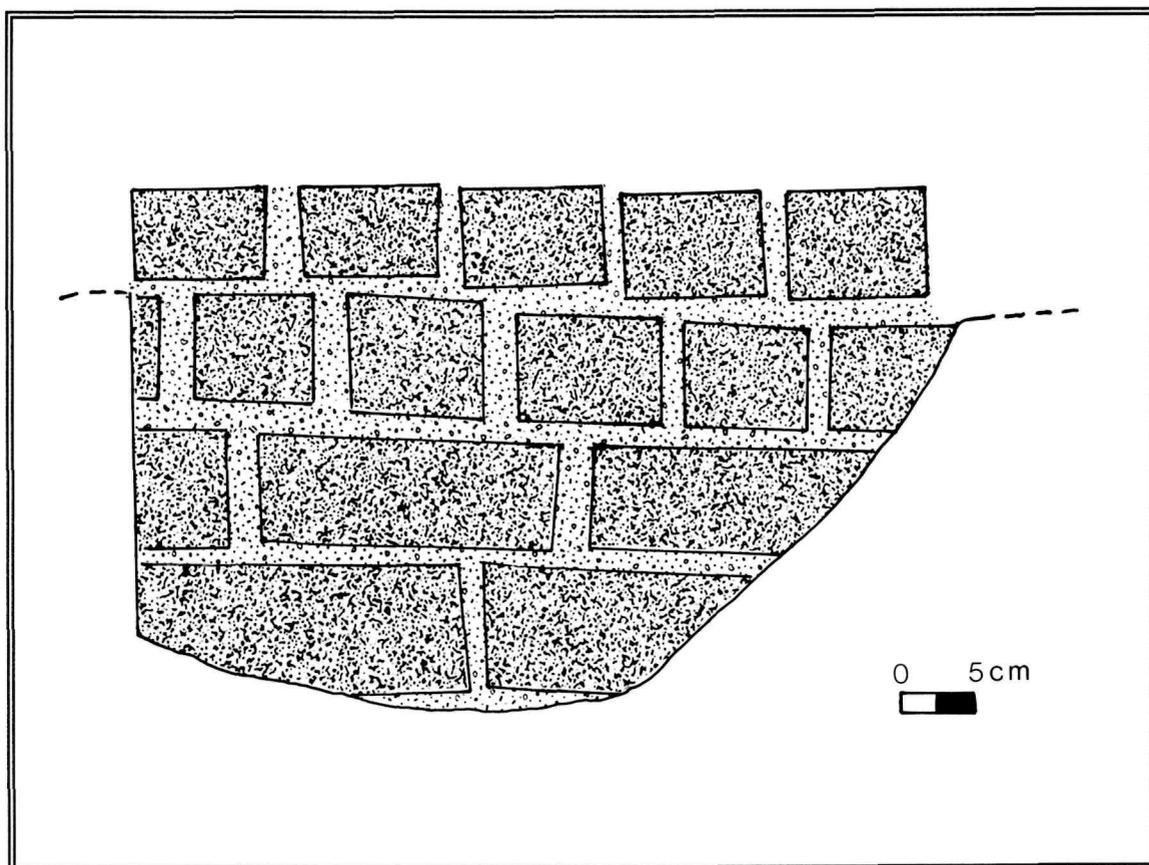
Profile of interior of the northwest wall of the Engine Foundation (16JE196).
